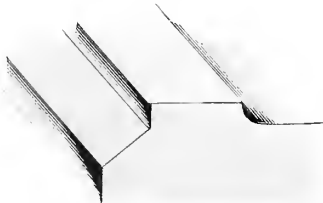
SECTIONAL CUT SHOWING FILLET AND CHAMFER MOULDING.
